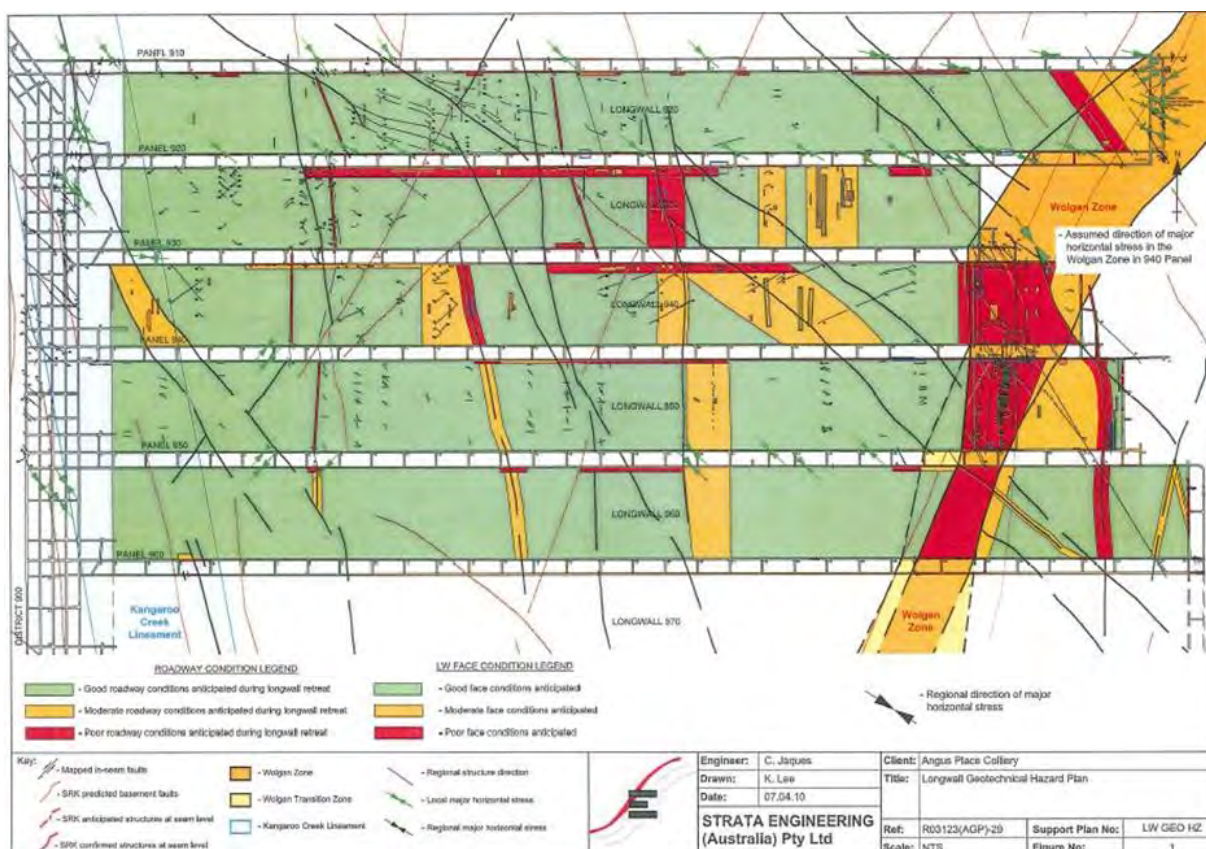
Angus Place Colliery Geotechnical Hazard Plan for the 900 Area
